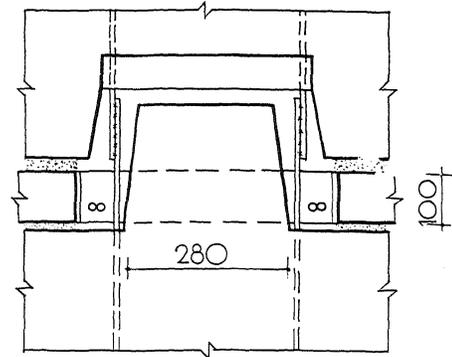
REINFORCED CONCRETE PROJECTIONS IN PANELS
